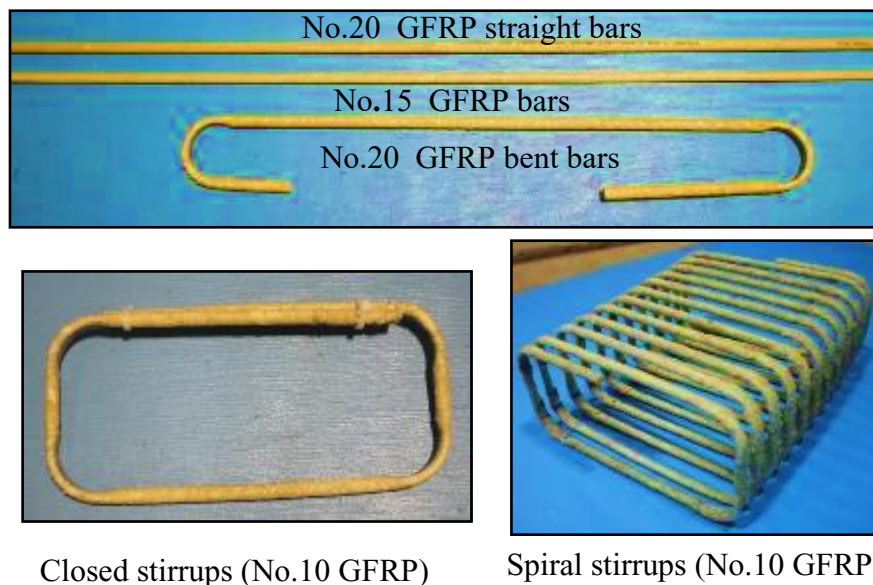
GFRP bars and shear stirrups reinforcement
